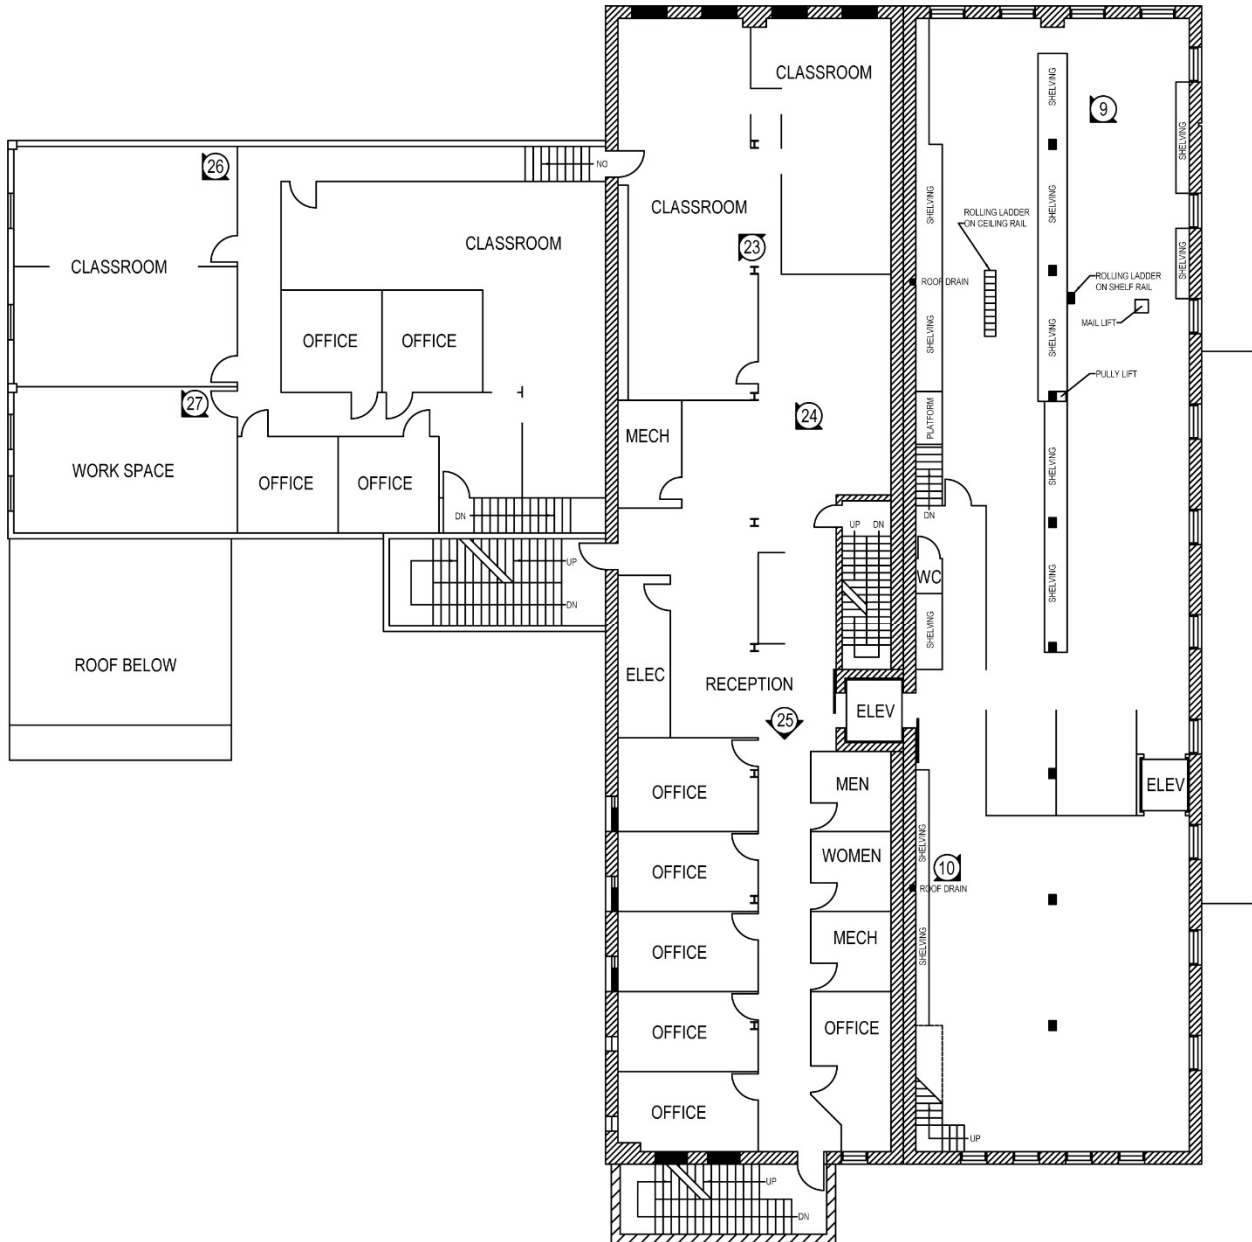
Second Floor Plan with Photo Locations (not to scale)
